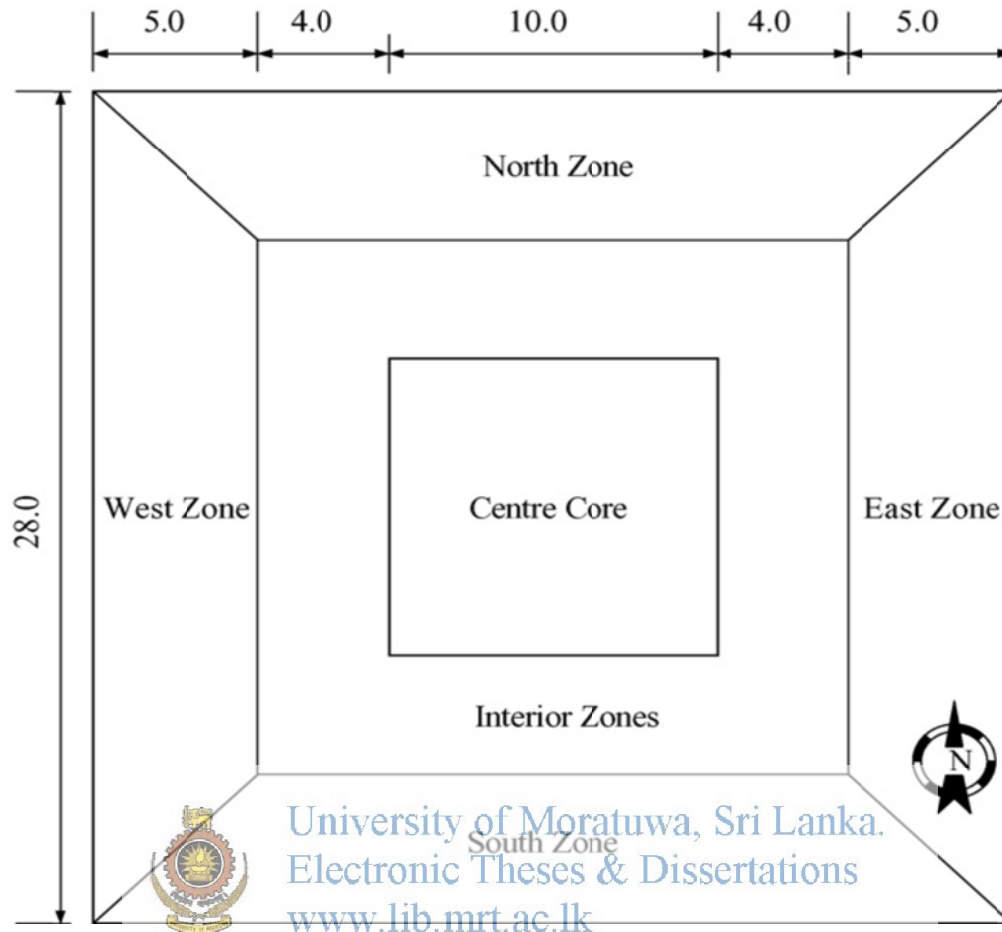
Typical floor plan of the sample building (unit in drawing: meters)
